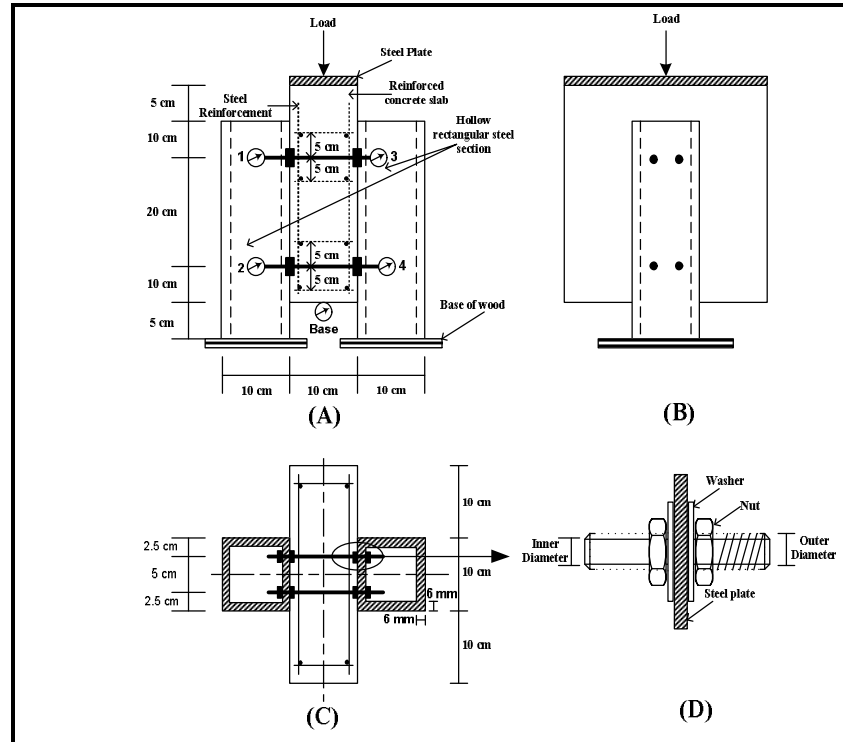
Dimensions and details of modified push-out test; (A): Front view; (B): Side view; (C): Top view; (D): Details of connection (magnified picture).
